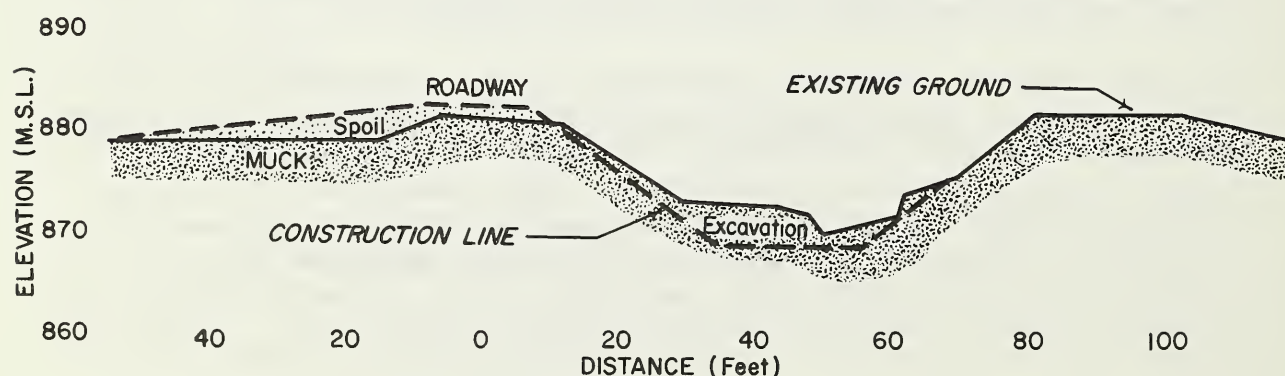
TYPICAL SECTION OF OPEN CHANNEL
